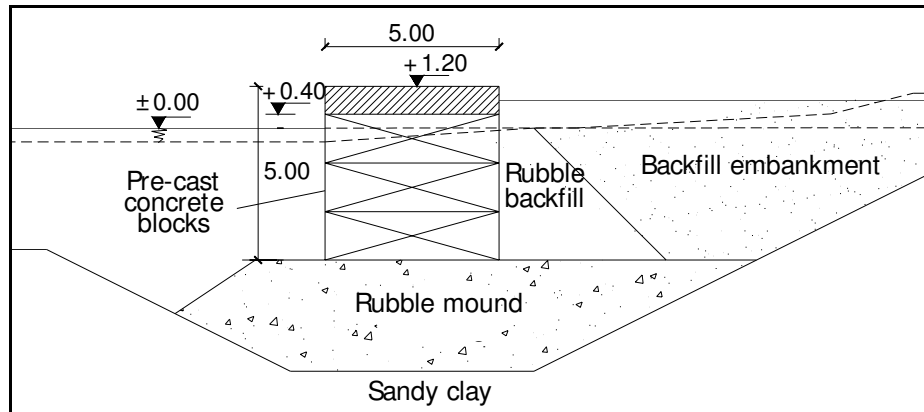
Typical cross-section of Marina-Lefkas quay walls
